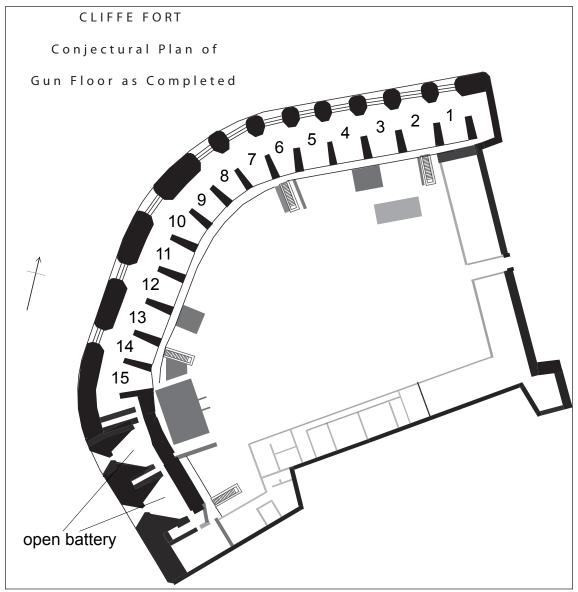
Conjectural plan of the battery as completed in 1875, based on the 1899 plan (TNA: WO78/4963) and investigation of the basement. The casemates are numbered as shown on the 1899 plan.
